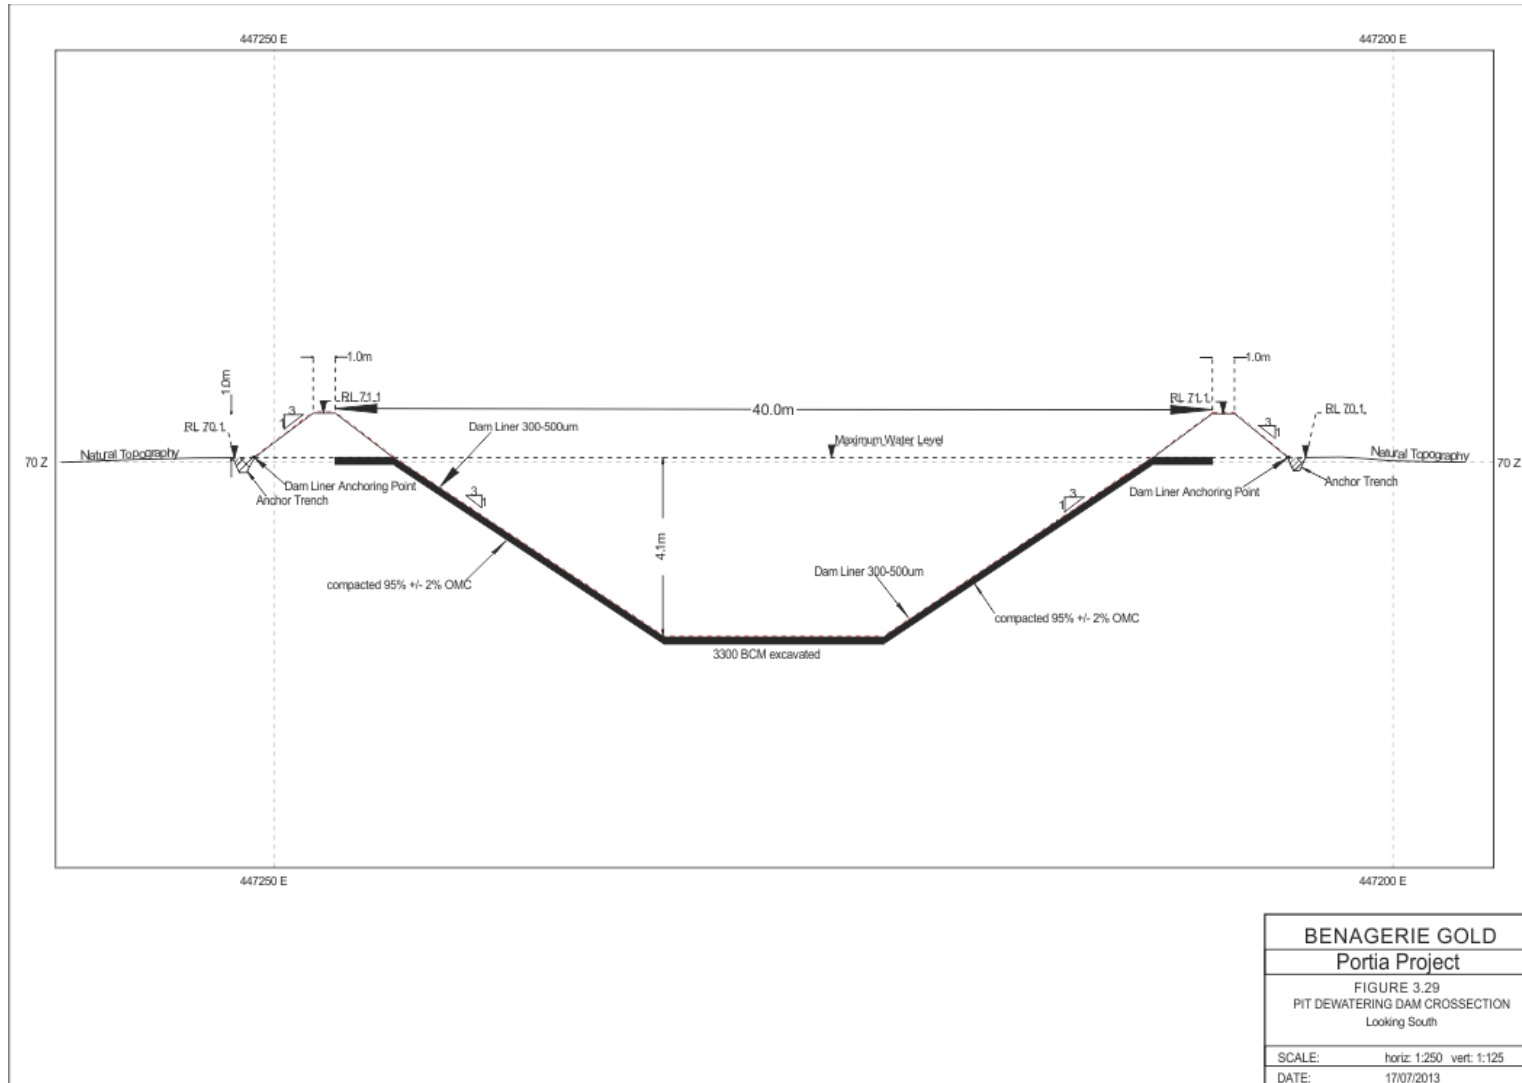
Cross-Section Looking South of the Pit Dewatering Dam (Design)
